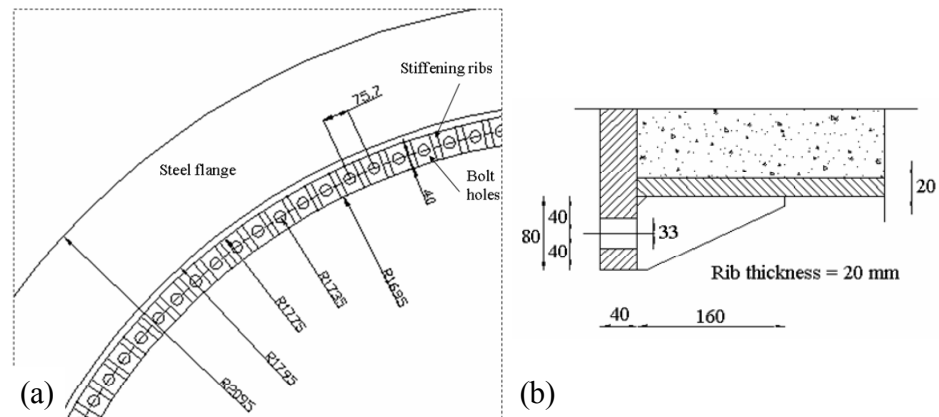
Geometry of the inter-modular joints: (a) bolt holes; (b) stiffening ribs (dimensions in mm)
